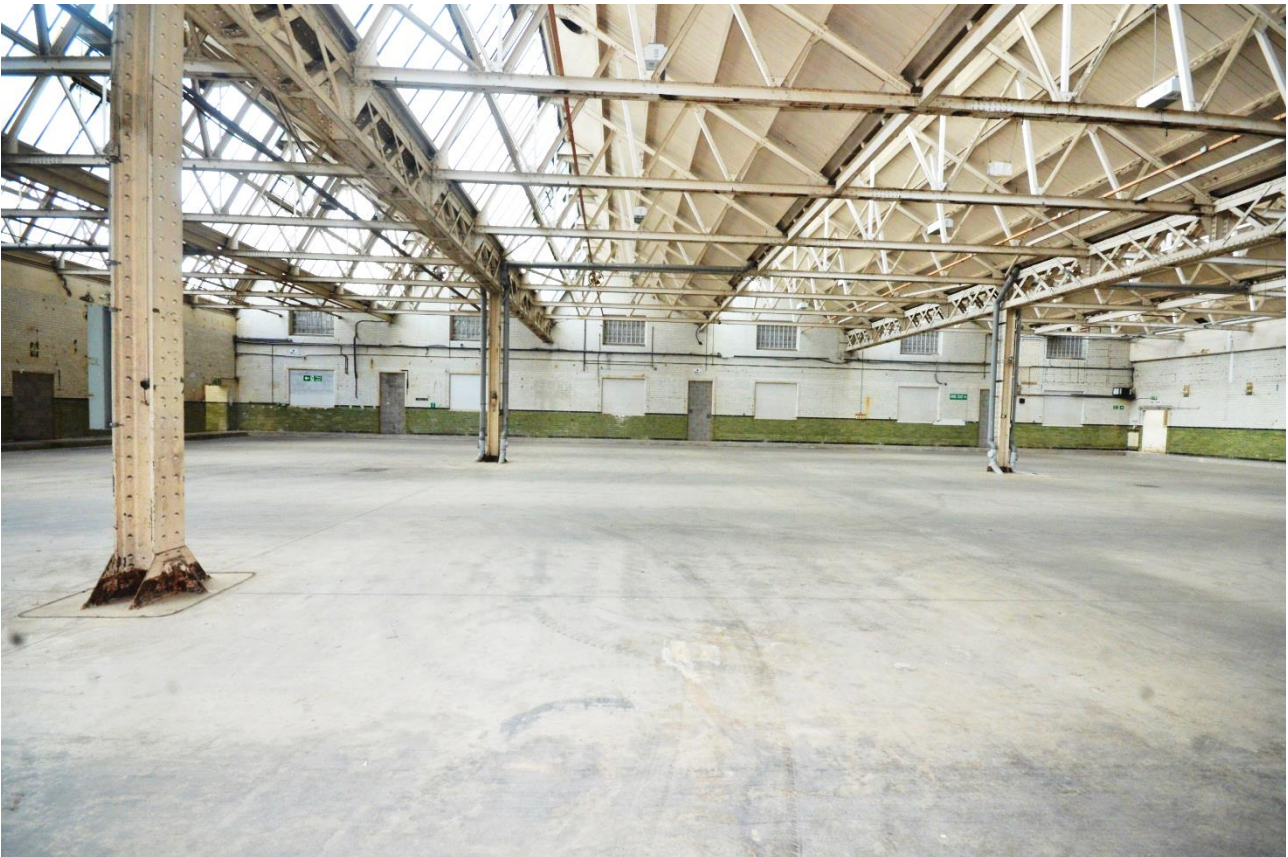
Blocked windows and doorways to administration building in southeast wall of room 4
